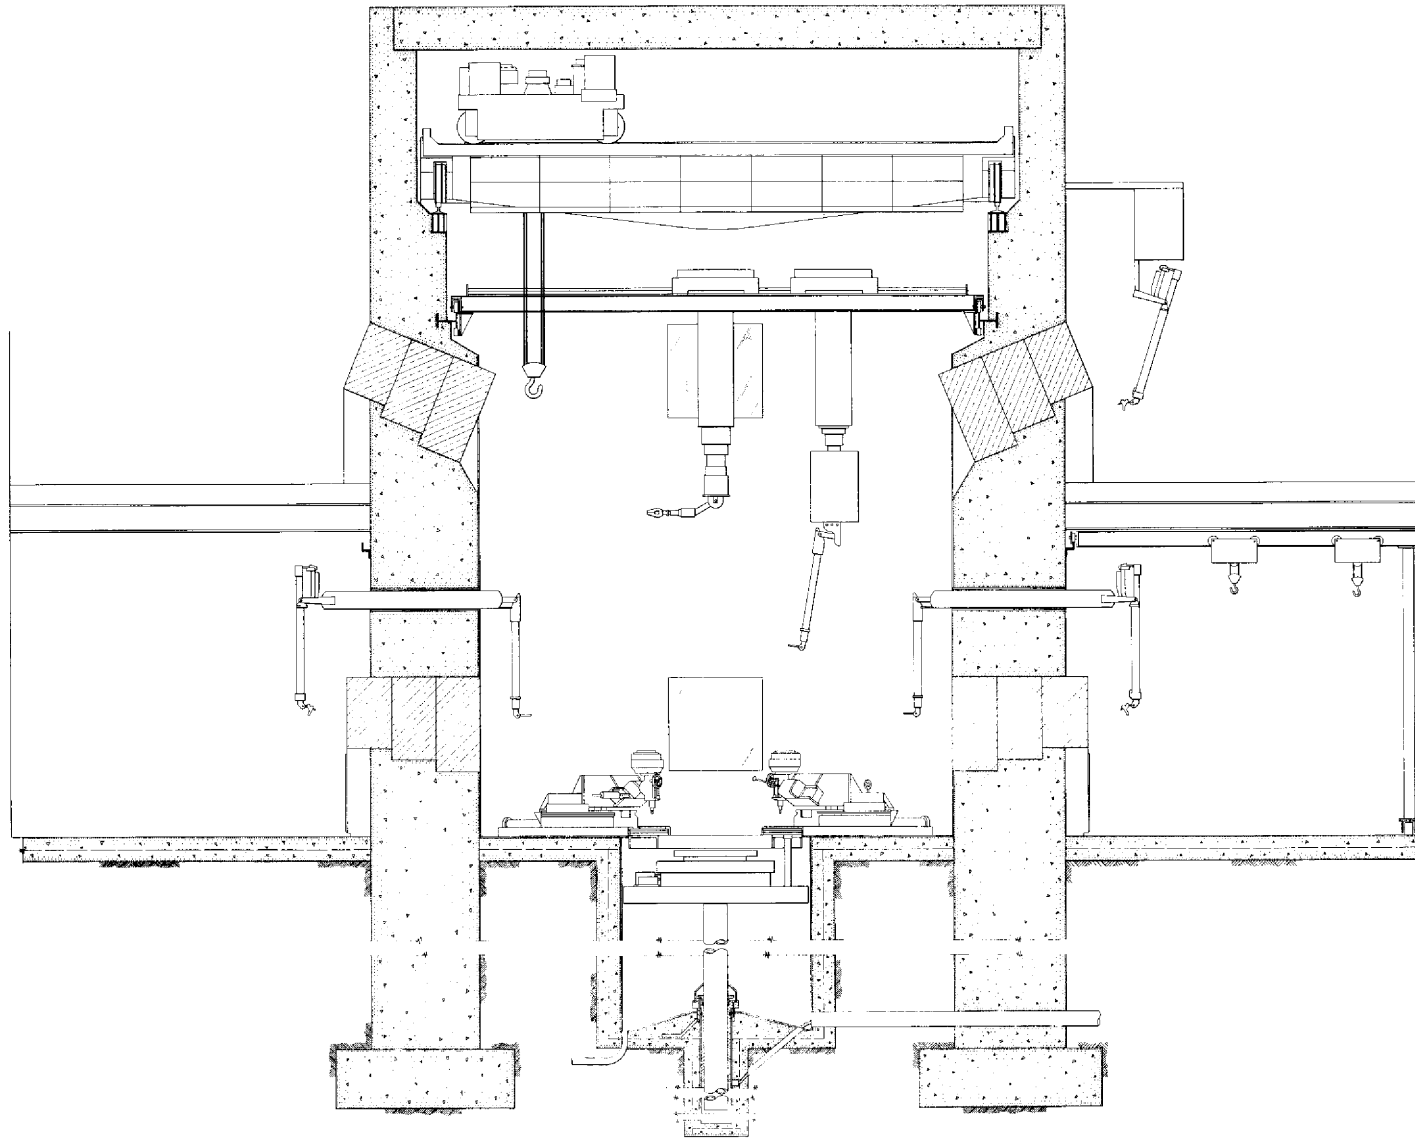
Proposed Reactor Disassembly Hot Cell: Section of Disassembly Area. Section A-A of Fig. 20.
